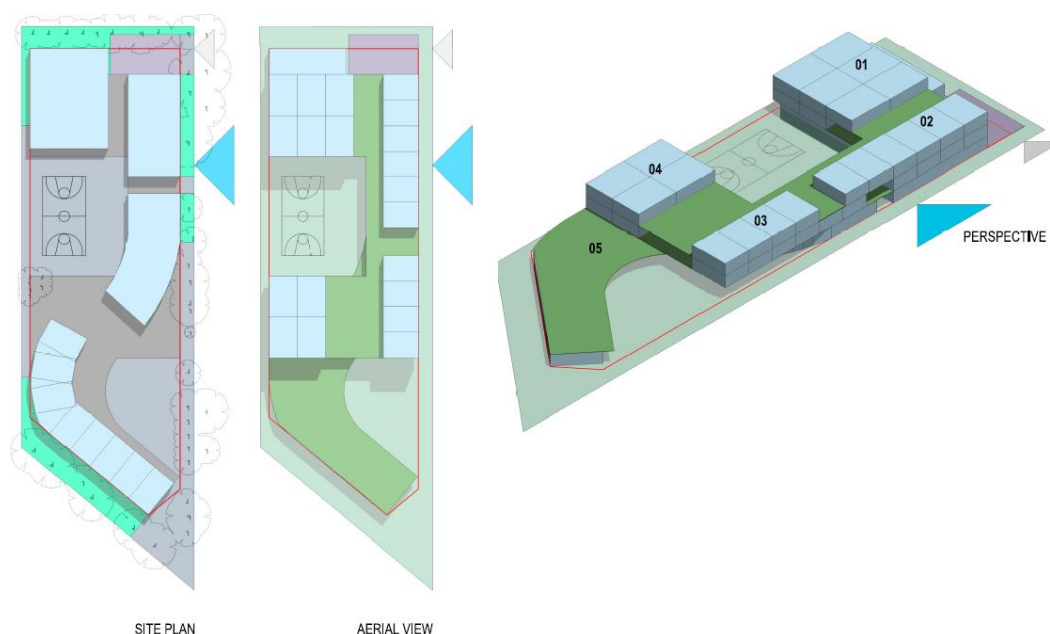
Extract of Option 3A – Remove All Buildings and Construct New School (Over 3 or 4 Stages)
